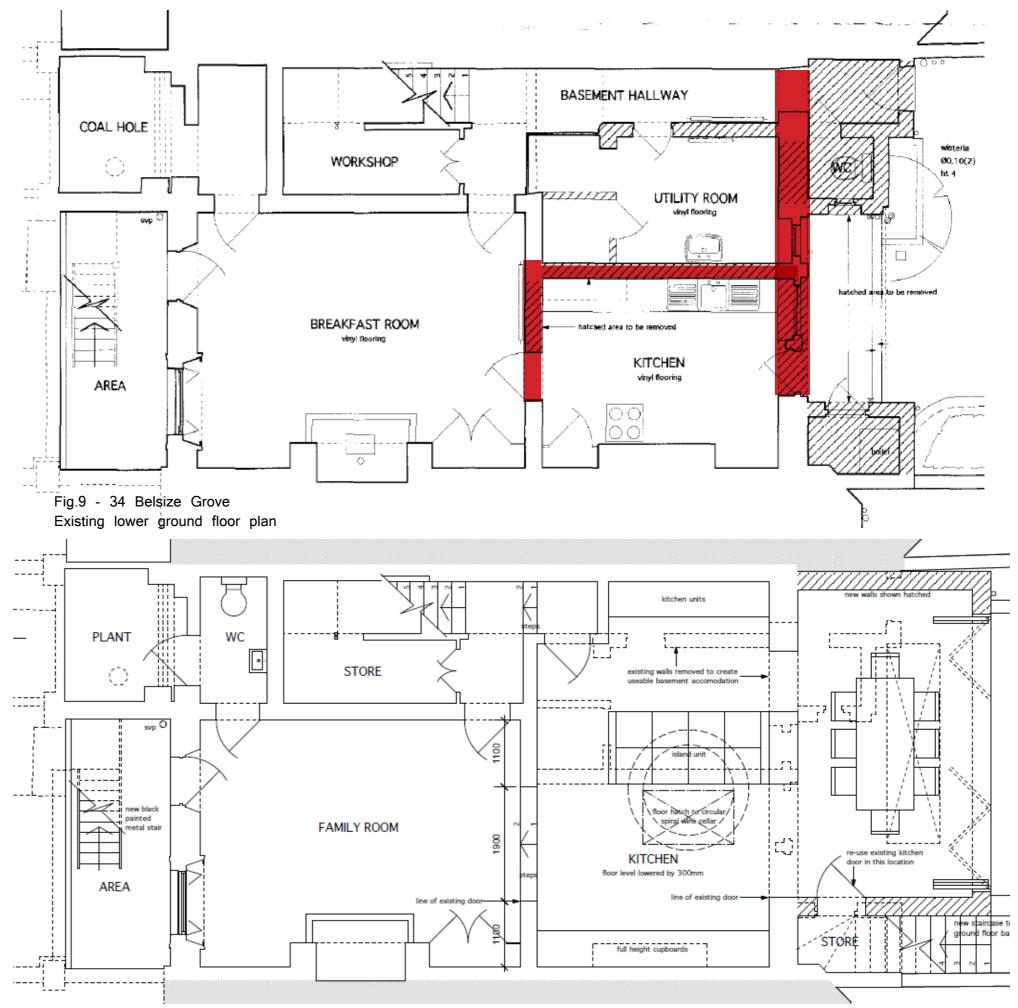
34 Belsize Grove Existing lower ground floor plan
